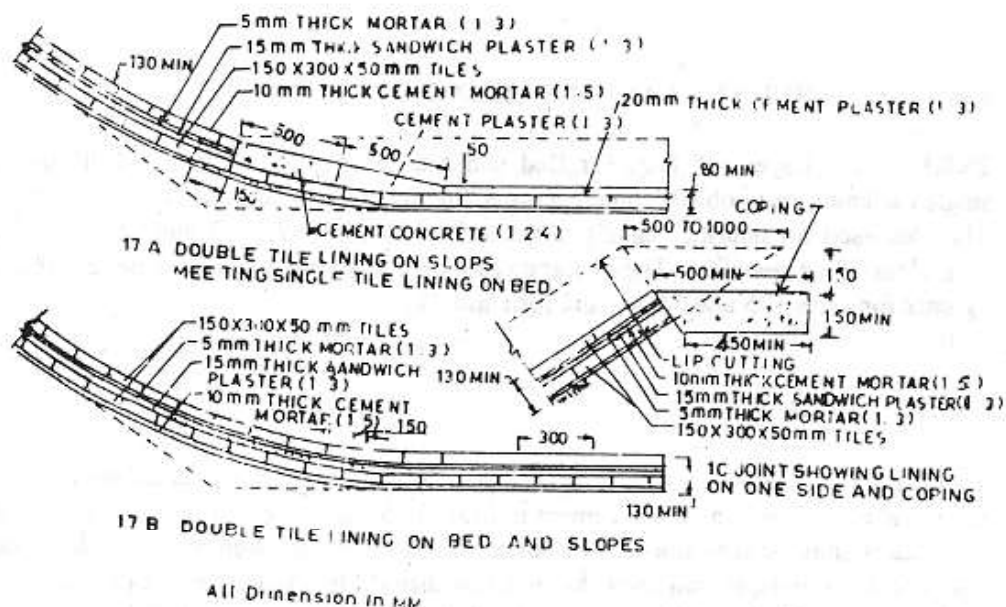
Typical Sketch Of Canal Lining With Burnt Clay Tiles
